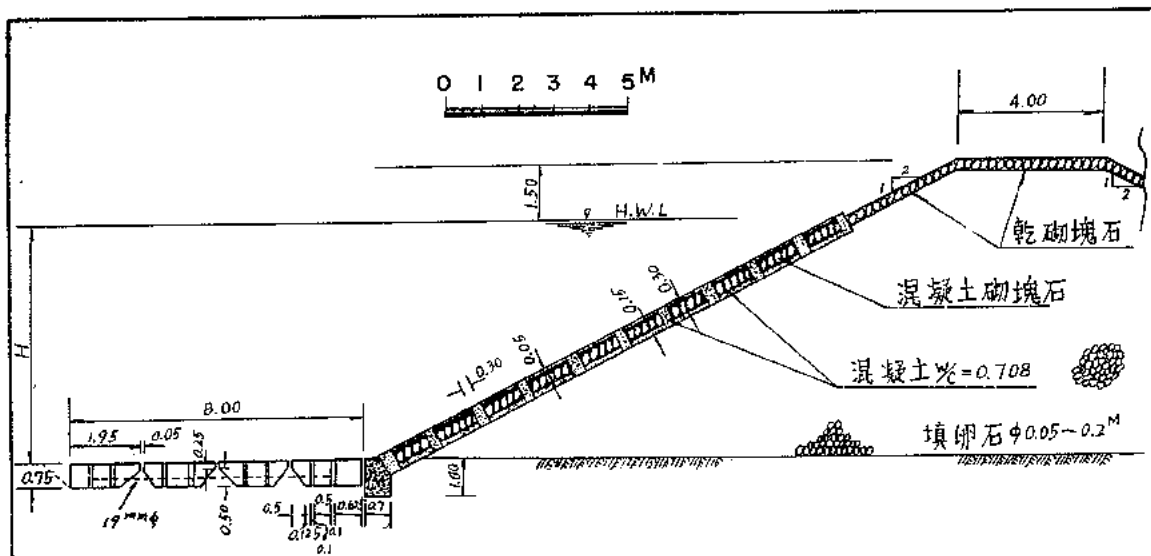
TYPICAL SECTION OF CONCRETE PITCHED STONE PAVING
